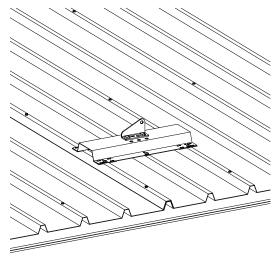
9 purlins 2 x 14G Fixings into purlin above OR below anchor plate (Refer to drawing no. D8467 for further details)
